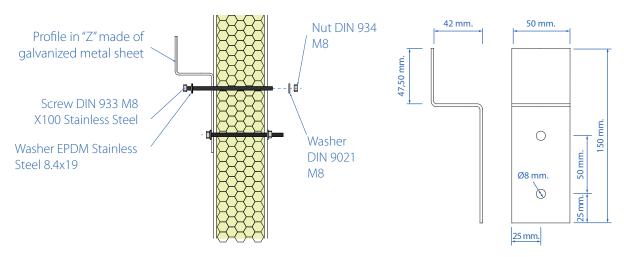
Screws and bolts to fix the profiles "Z" made of a galvanized meal sheet.
